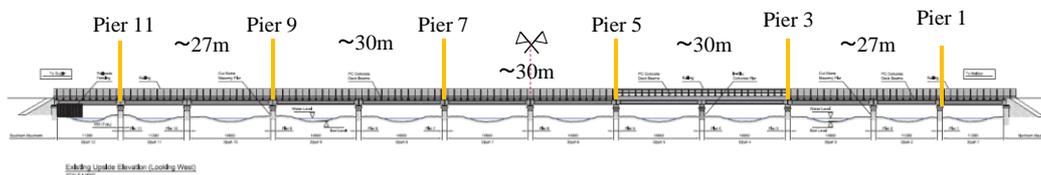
UBB 30 - Longitudinal frame arrangement 3
